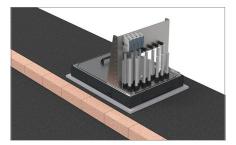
Cut the AC/DC installation cable to length and fit the appropriate compression cable lugs and wire end ferrules.
